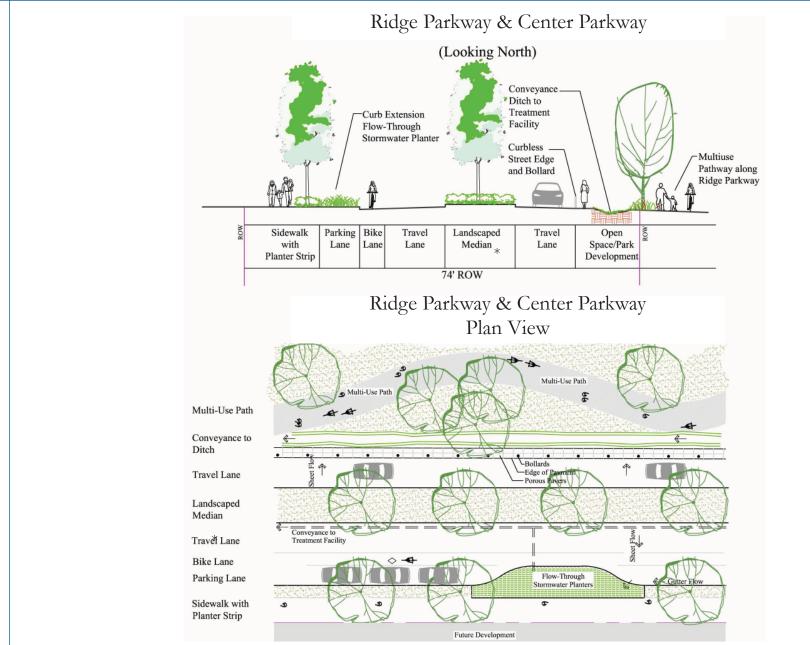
Ridge Parkway and Central Parkway Green Streets
